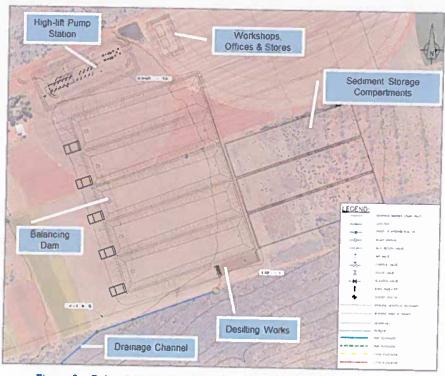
Balancing Dams, Desilting Works and High-lift Pump Station
